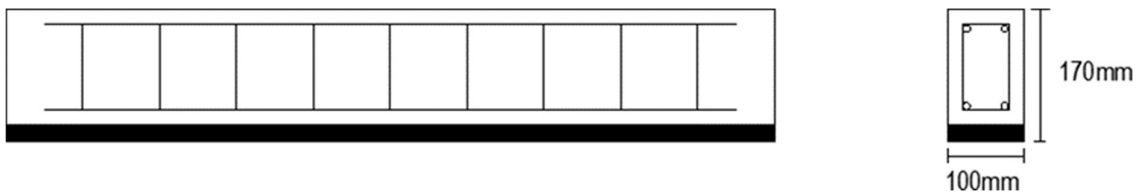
Longitudinal and Cross Section of Retrofitted Beam (Only Bottom)
